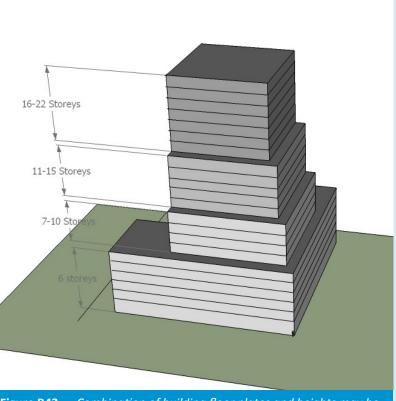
Combination of building floor plates and heights may be permitted subject to other development criteria being met
